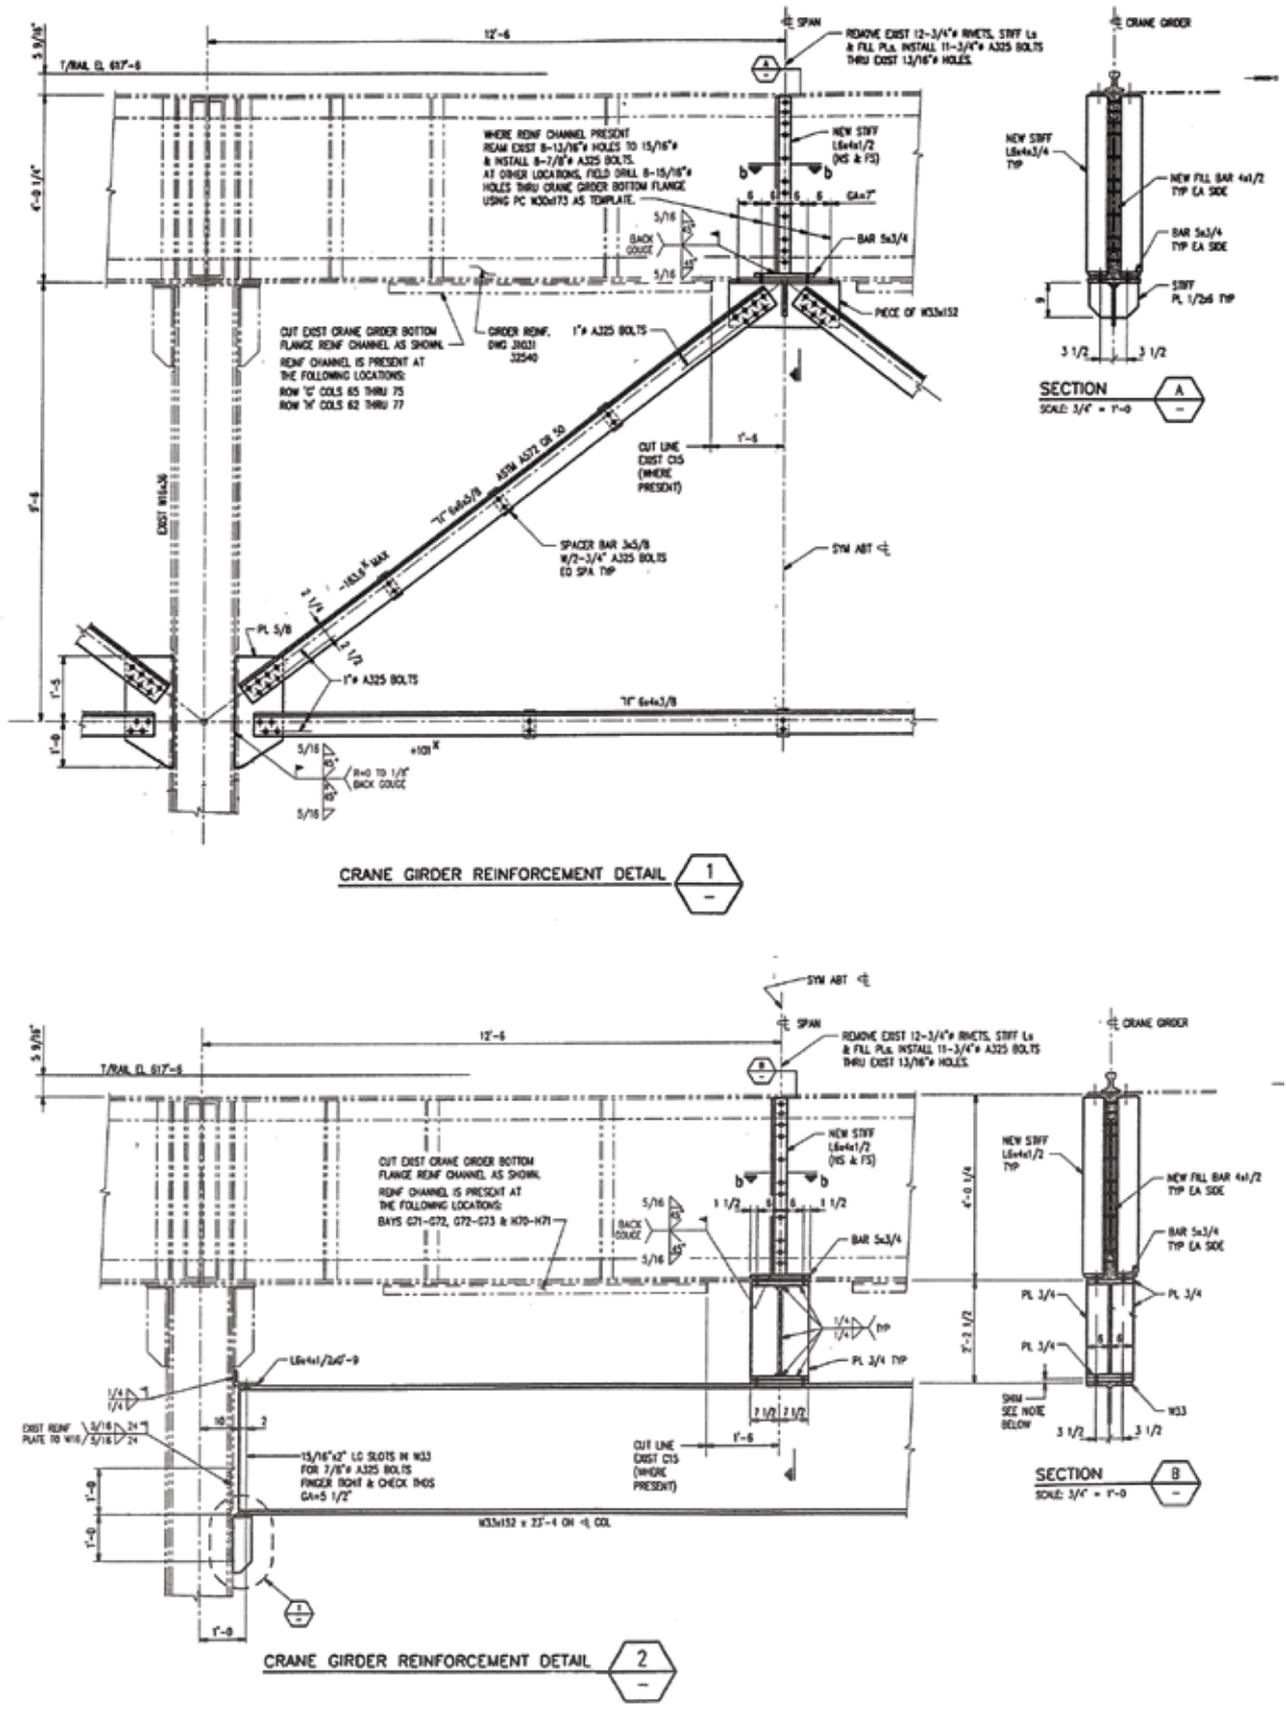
illustrate a few examples of non-conventional crane girder reinforcements.
